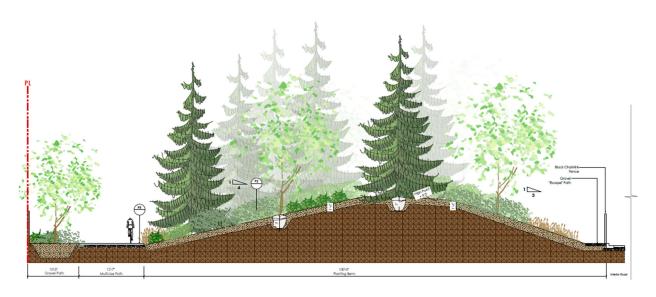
Berm section adjacent to Fieldstone Walk subdivision
